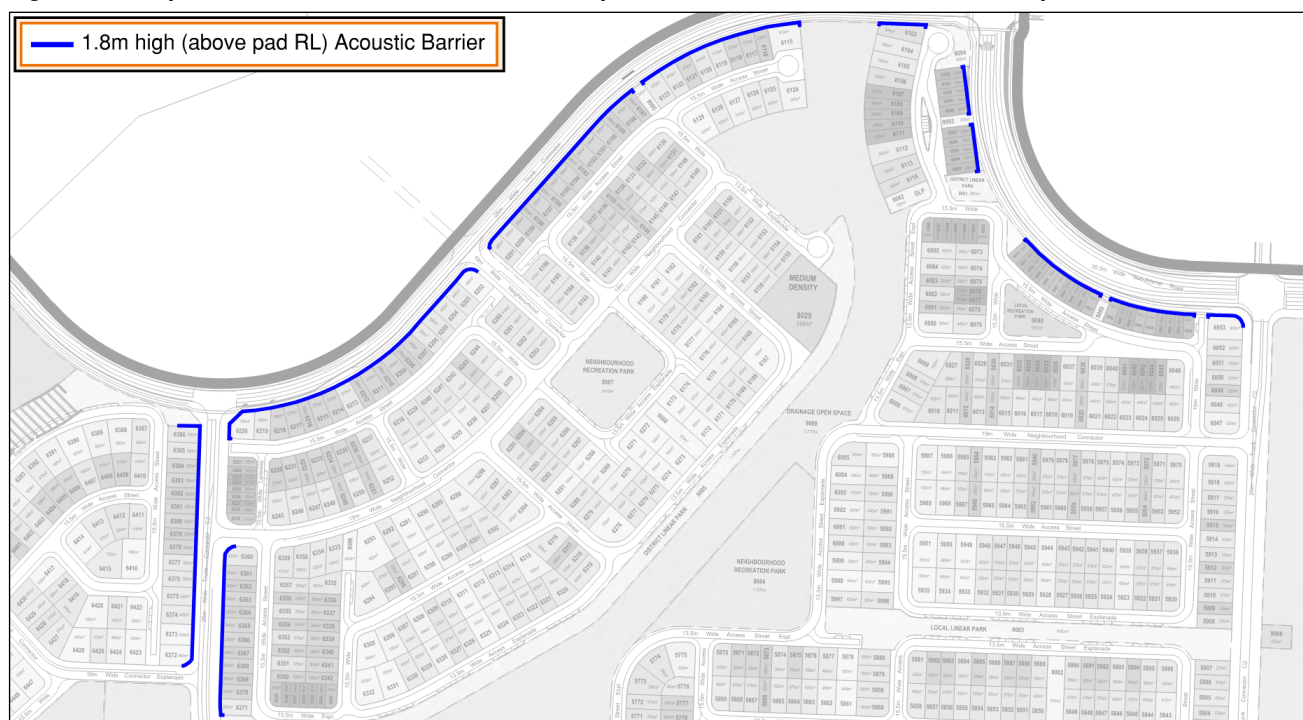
Proposed internal road acoustic barriers (Southwest Section - Southern Barriers)
